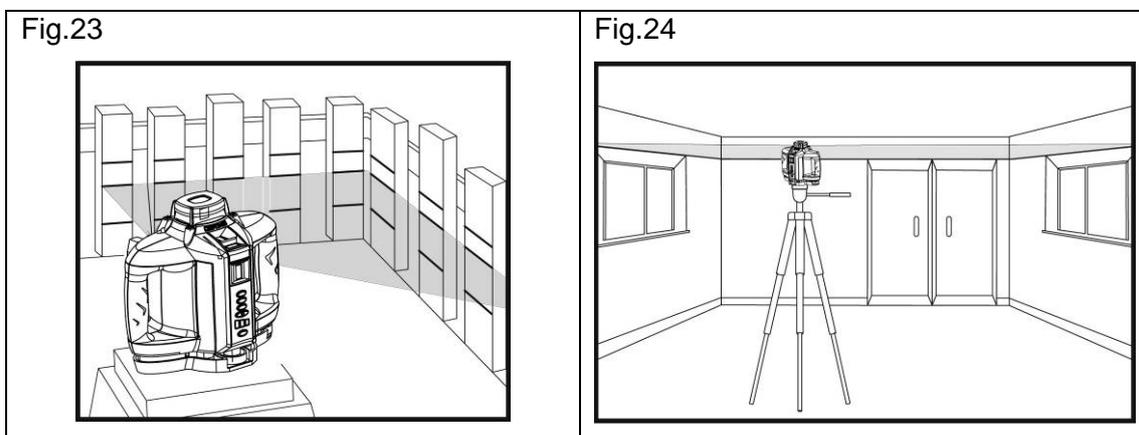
illustrates its use in aligning electrical outlet positions on stud work with two adjoining walls.
